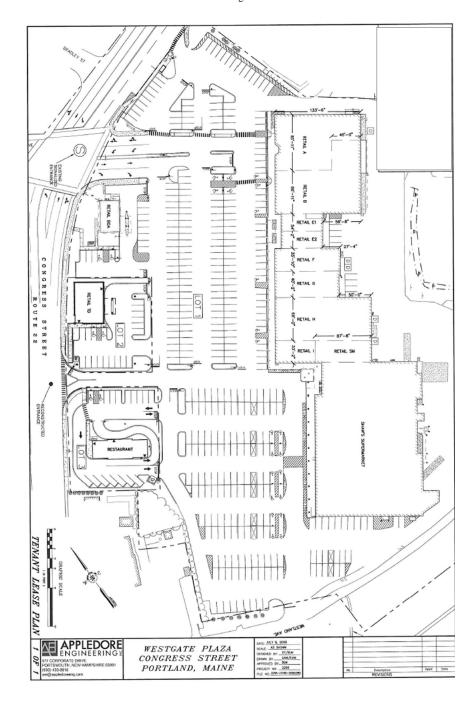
EXHIBIT B SITE PLAN SHOWING THE PREMISES
